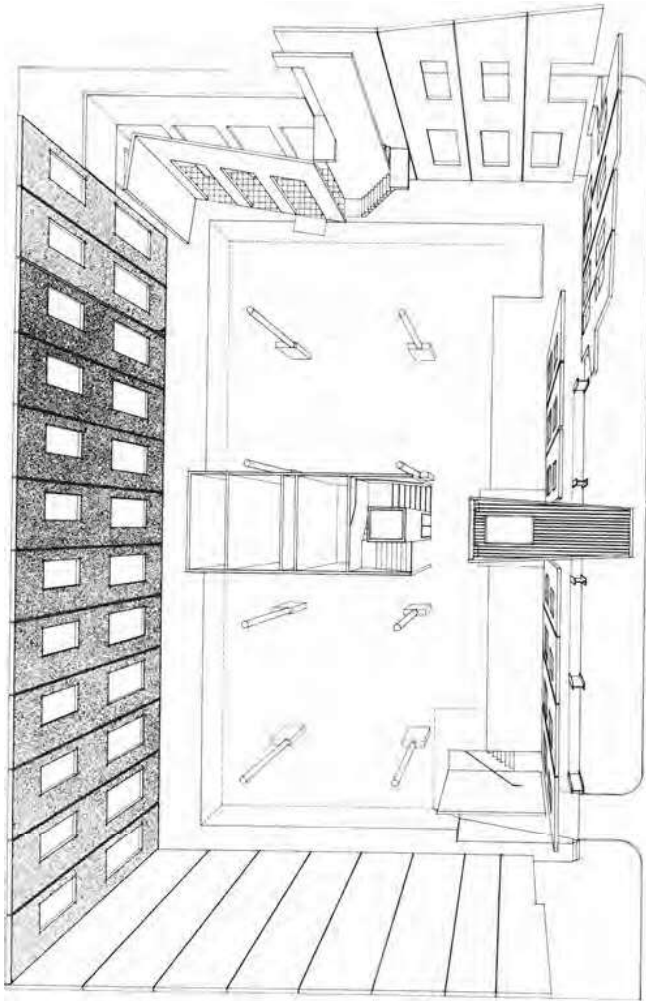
A 1994 plan of the ground floor, as if looking down from an elevated perspective
